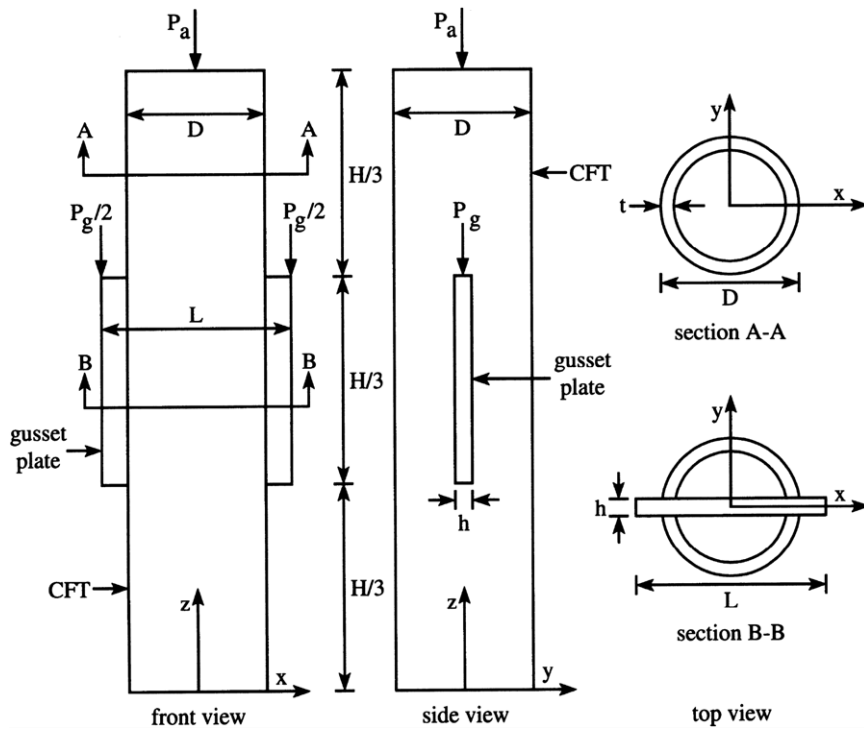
Geometry and loading of gusset plate type CFT-to-Bracing connection.
